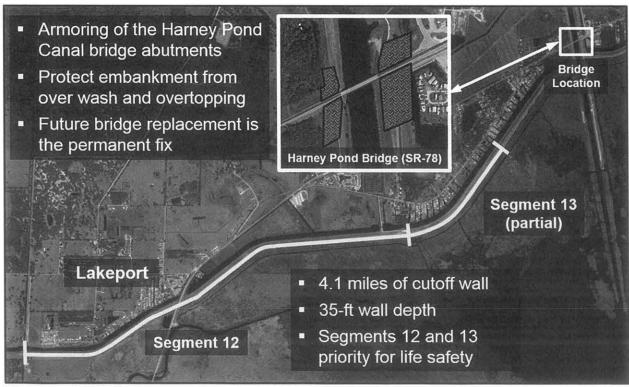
HHD Common Inundation Zone C proposed cut-off wall and armoring.
